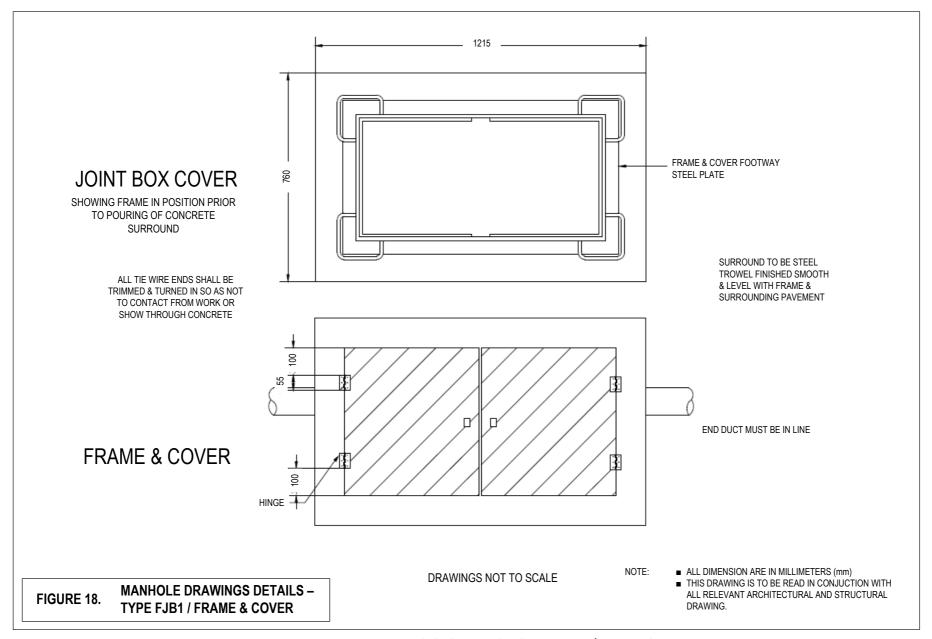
Manhole drawings details – Type FJB1 / Frame and cover
